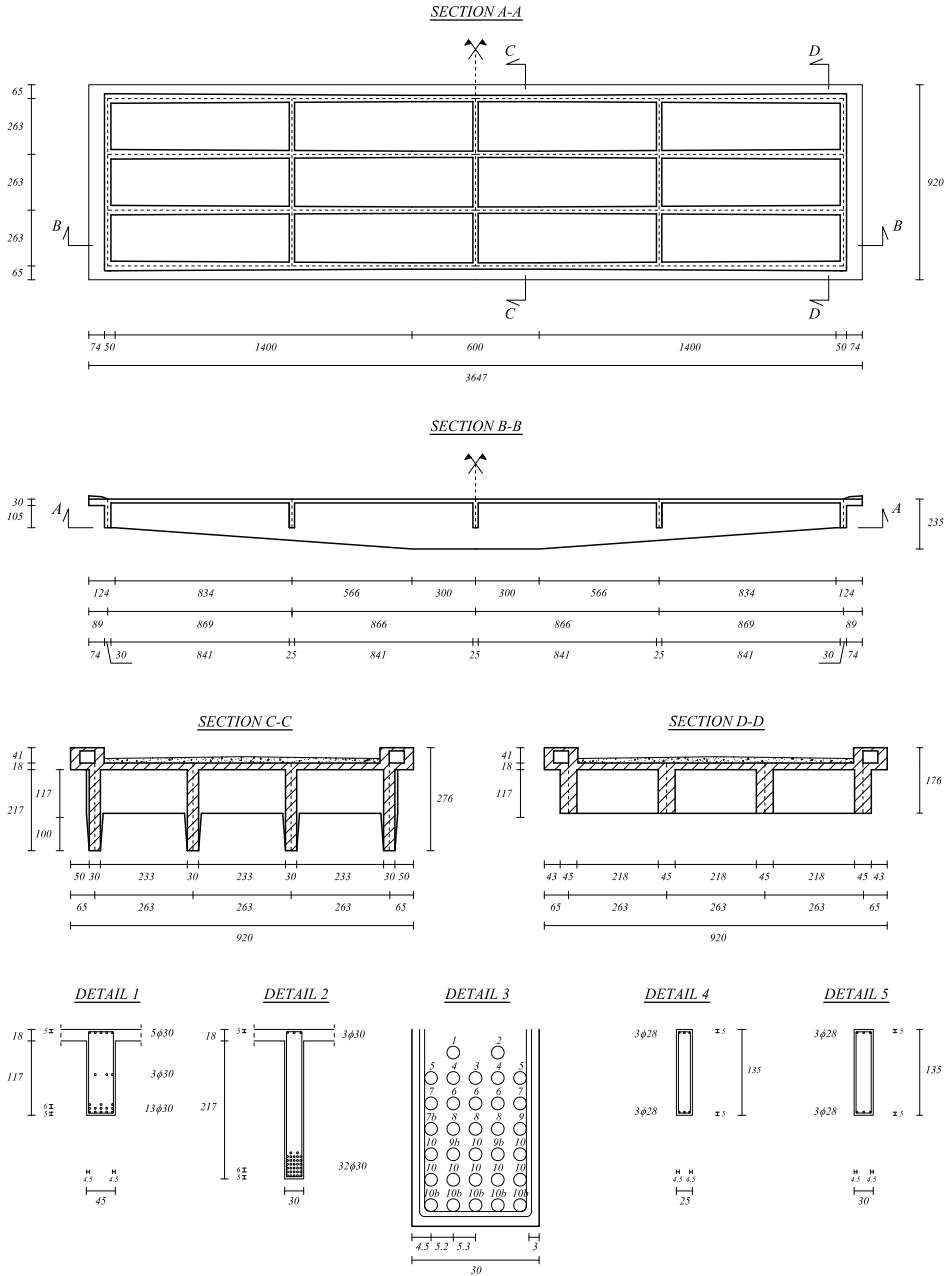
RC grillage deck. Geometry and reinforcement of the characteristic sections. Details 1, 2 and 3 refer to the longitudinal beams section. Details 4 and 5 identify the cross-beams section (units in cm).
